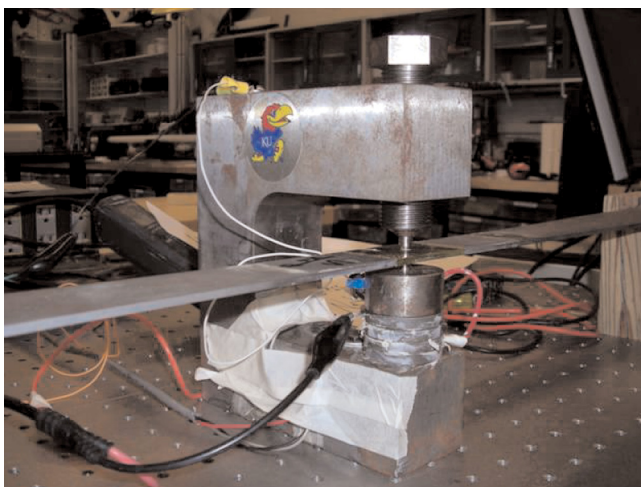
PICK tool being used to treat a crack-stop hole in a steel fatigue specimen.
